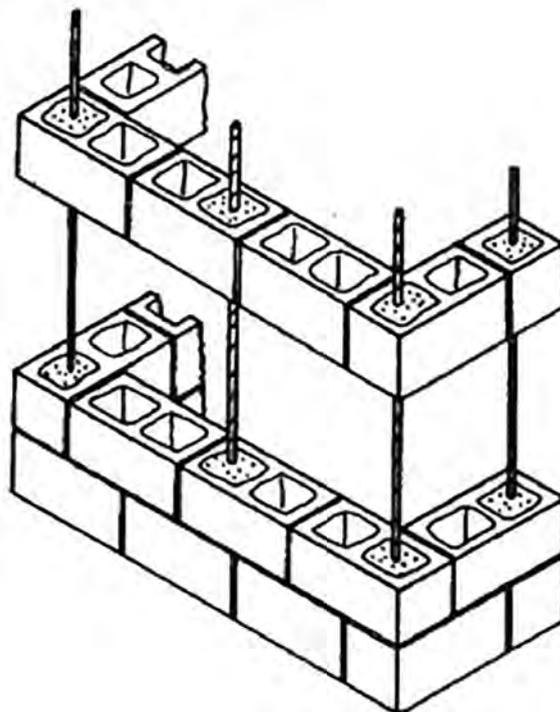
CORNER DETAIL FOR PARTIALLY GROUTED MASONRY WALL
